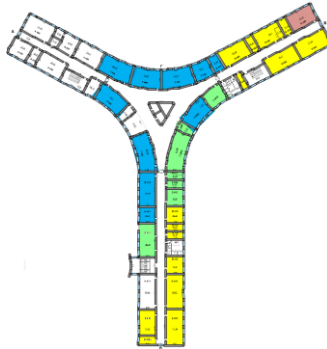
The plan of one floor of the building of the academic building of Sevastopol State University
